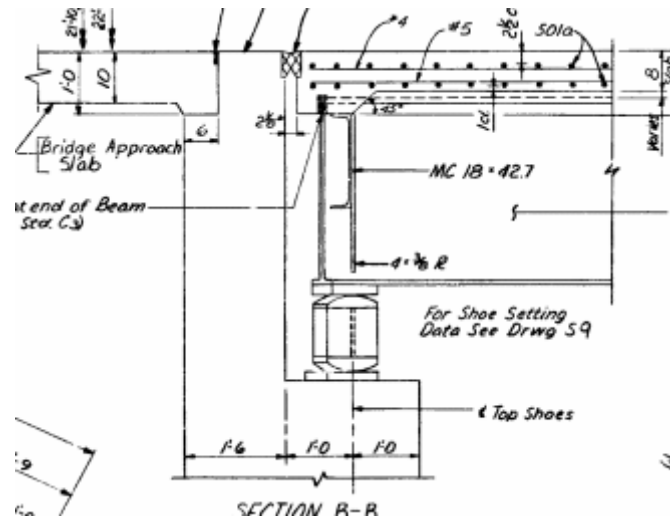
Abutment Detail of the Bridge (NBI 22190) (1981)
